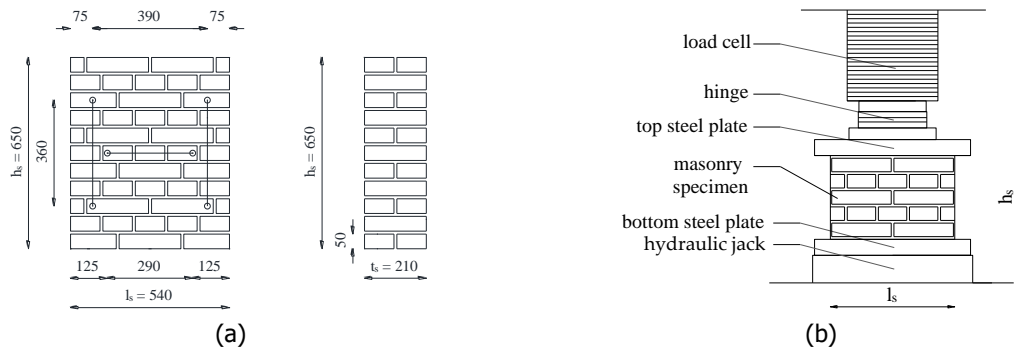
(a) Dimensions of the double wythe clay brick masonry wallets; (b) compression test set-up.
